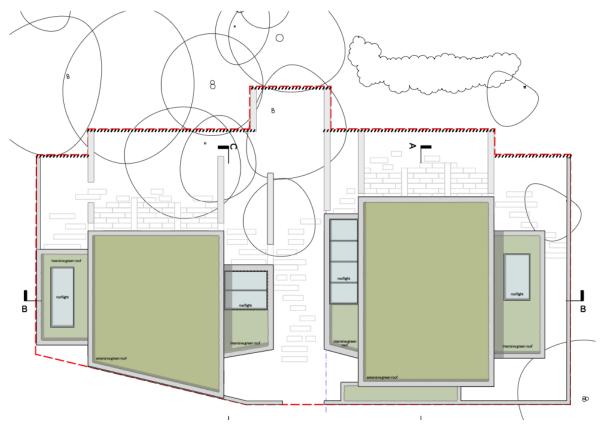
Proposed areas of extensive (dark green) and intensive (light green) green roof.
